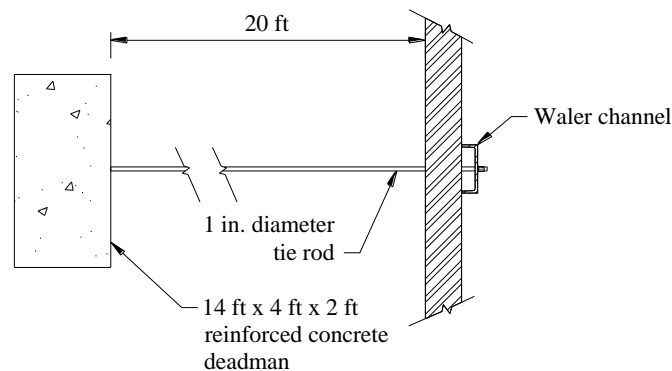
Deadman to sheet pile abutment and backfill retaining system connection
